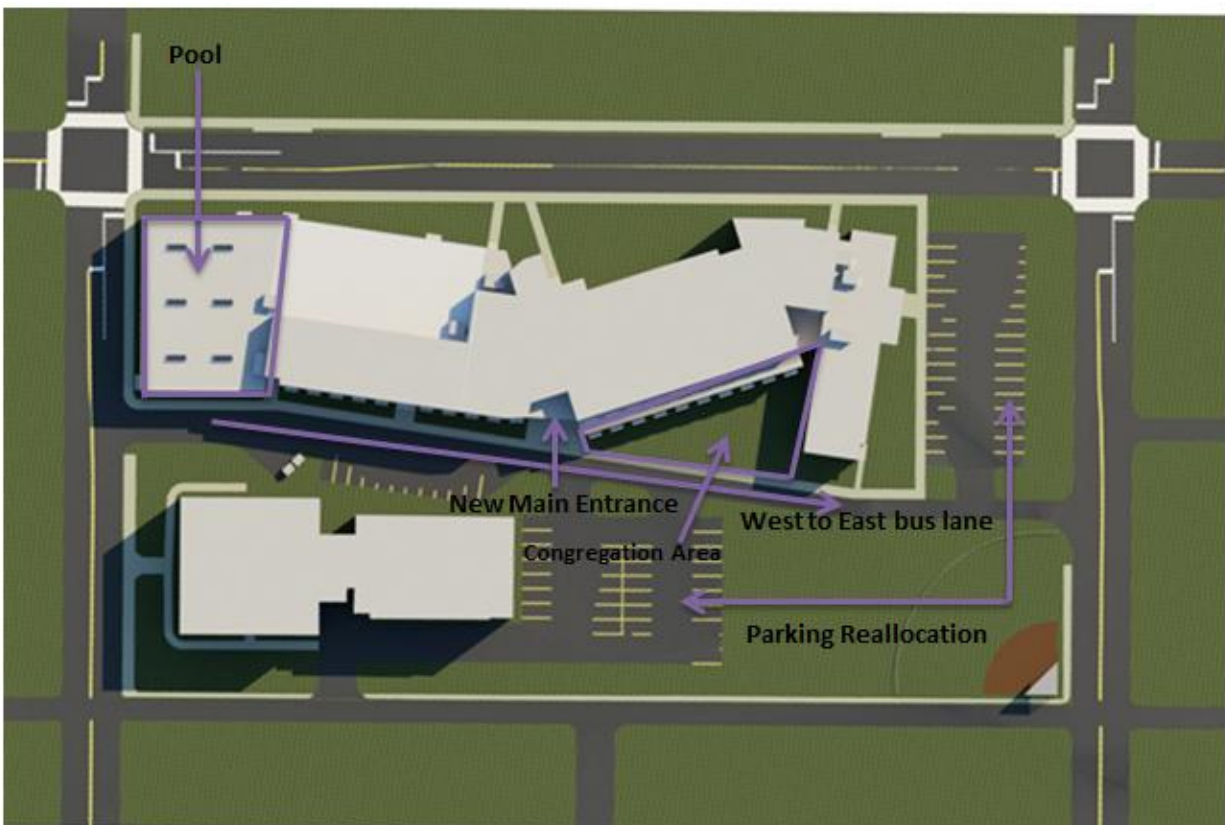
Nexus site plan (building moved east, parking reallocated, pool addition)
